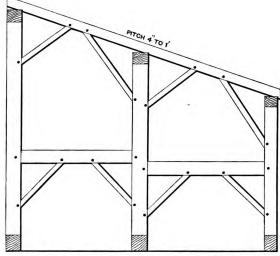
Sketch of an Inclined Plane with Pitch of 4 Inches to the Foot.
